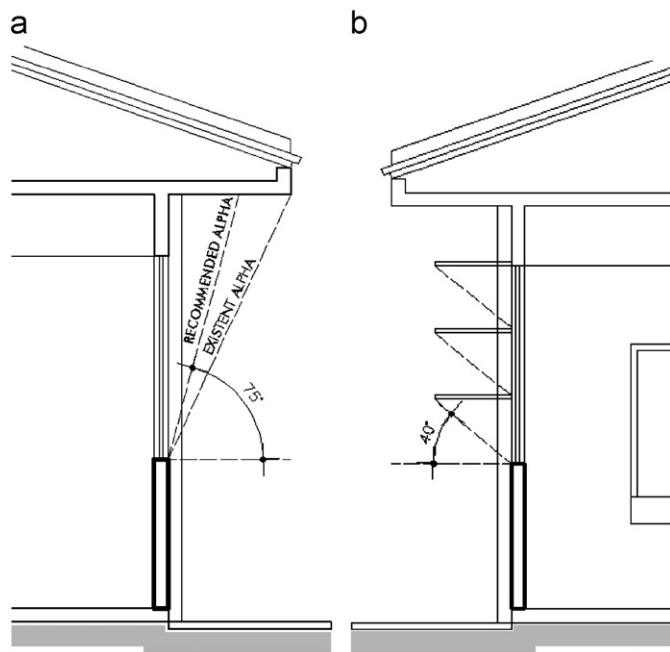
Shading device: (a) NE façade and (b) SW façade.
